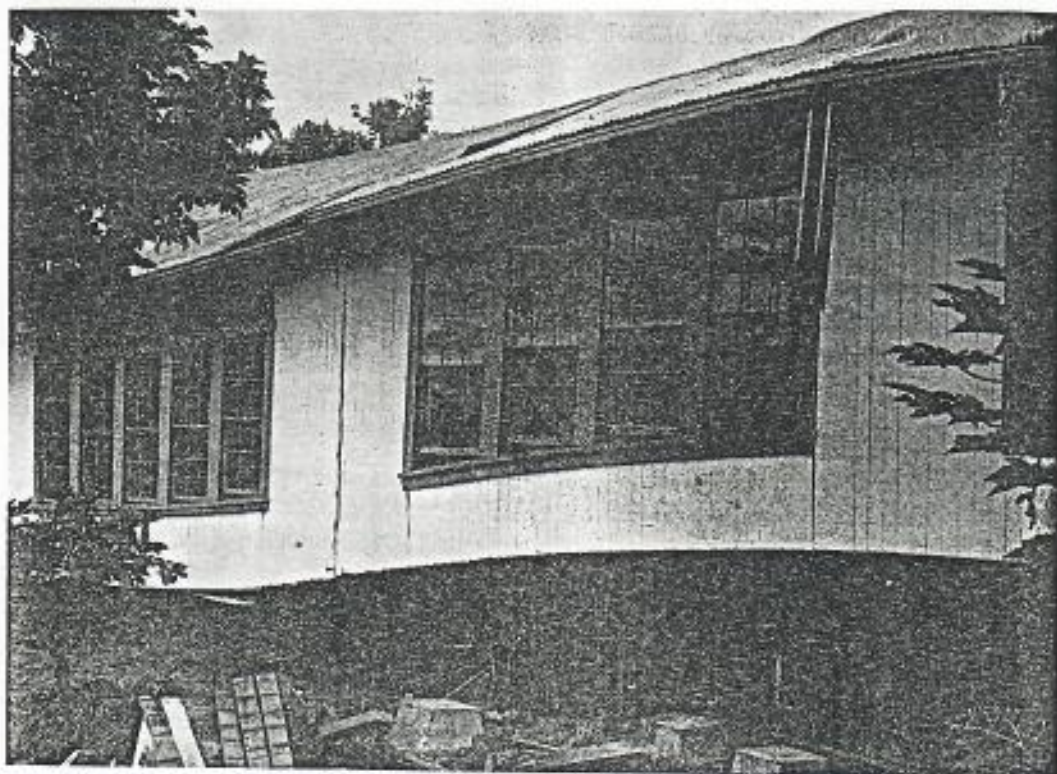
Central portion of Honaunau School, from the southwest. All but the south end of this building was let down and moved westward owing to inadequate bracing of the underpinning in an east-west direction transverse to the longer dimension of the building.
